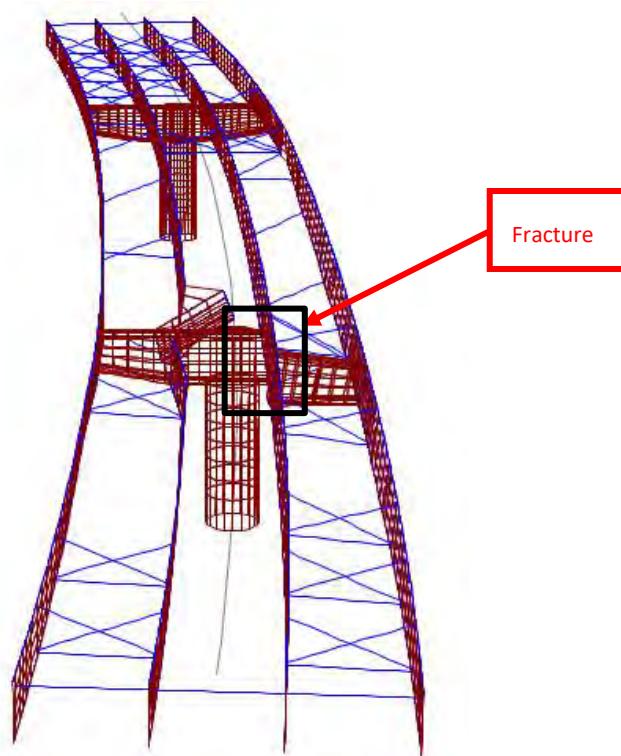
Deformed shape of CSi Bridge Independent Model at last stage of analysis (Deck not shown for clarity)
